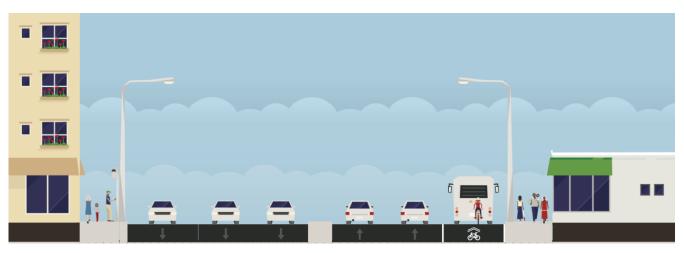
109 Street Facing North (South of 86 Avenue)
